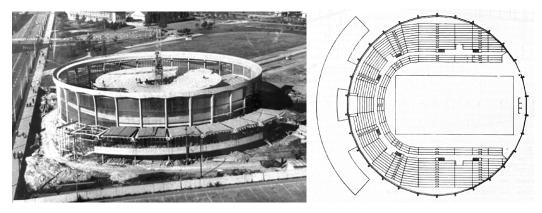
The Hall in New Belgrade under construction (left) and building's plan (right) ([5], 3, 10)
